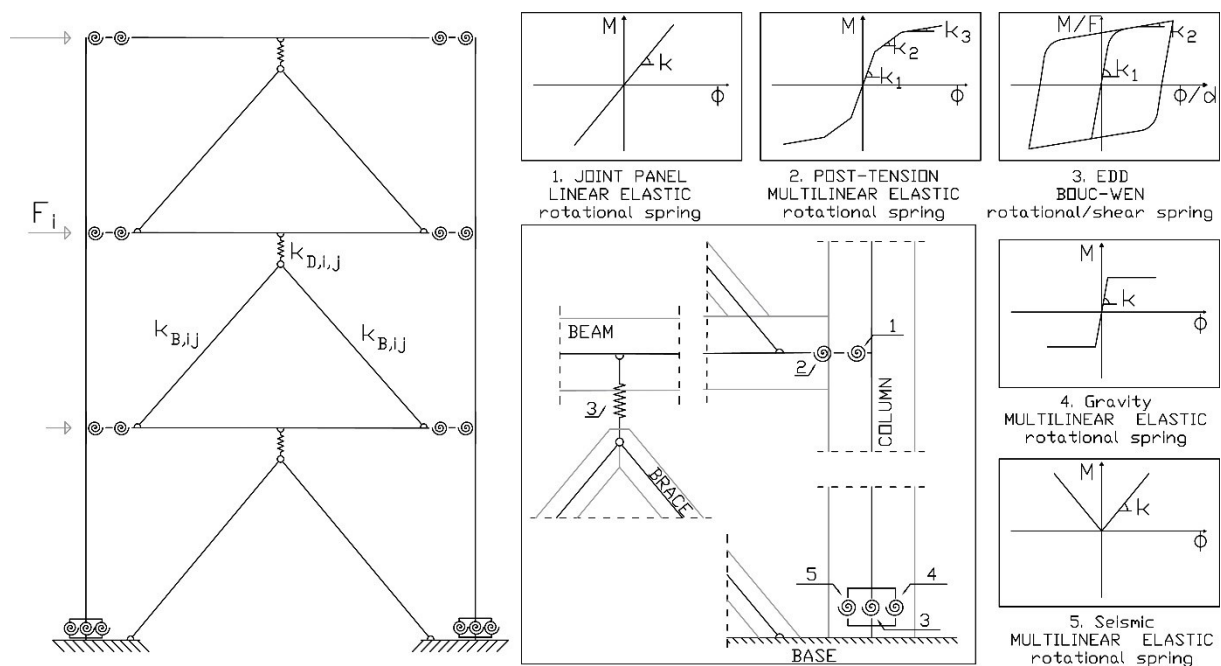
Numerical modelling of the frame with dissipative bracing systems and details of: (a) dissipative bracing connection; (b) beam-column joints and (c) column-foundation joints.
